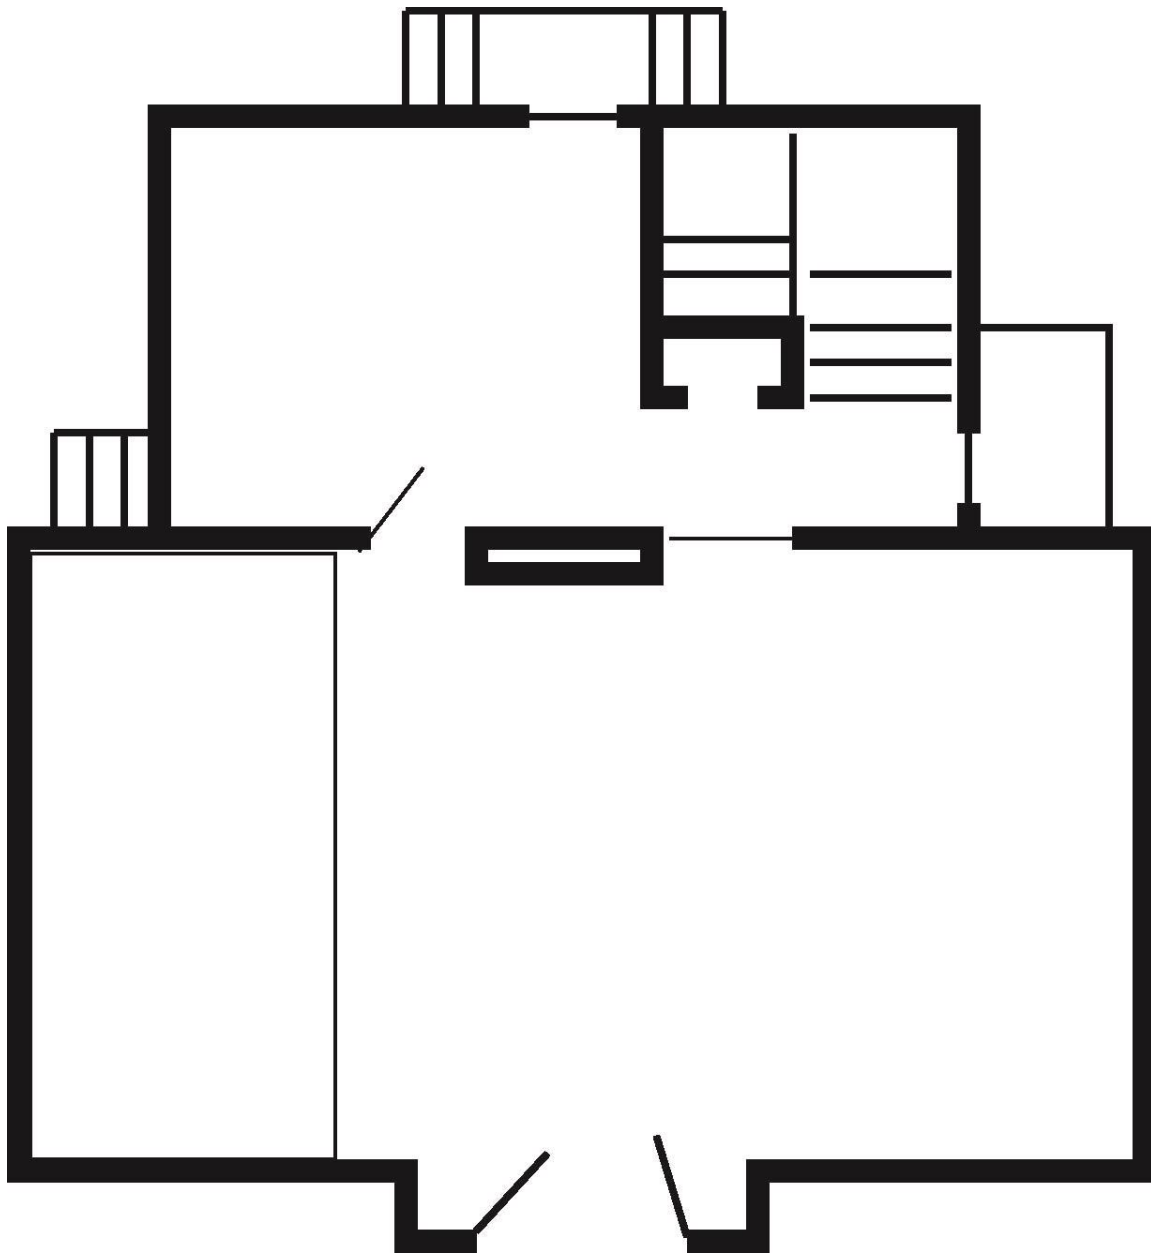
Floor plan of 1936 blockhouse structure today. Floor layout varied over time but excepting the shed roof, these are the permanent walls. Stairs lead into the basement and a fireplace is central to the building.
